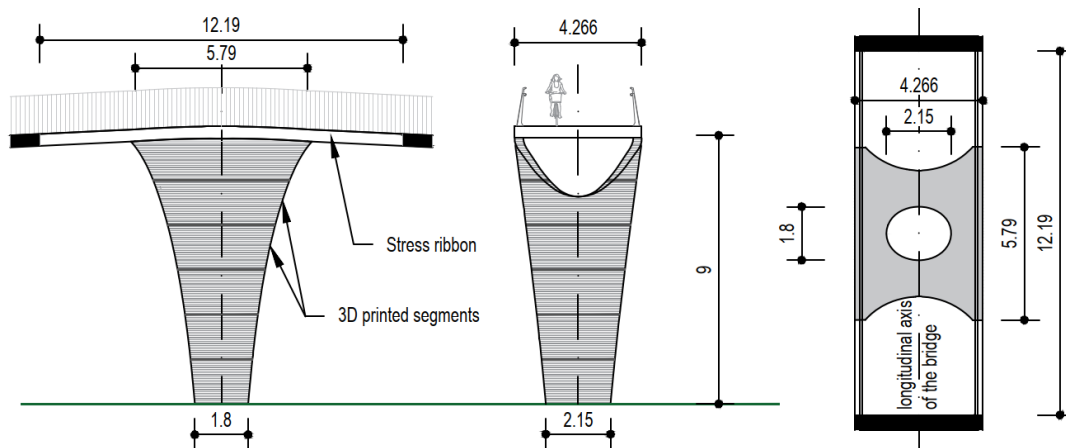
Longitudinal, transverse cross section and plan of the bridge.
